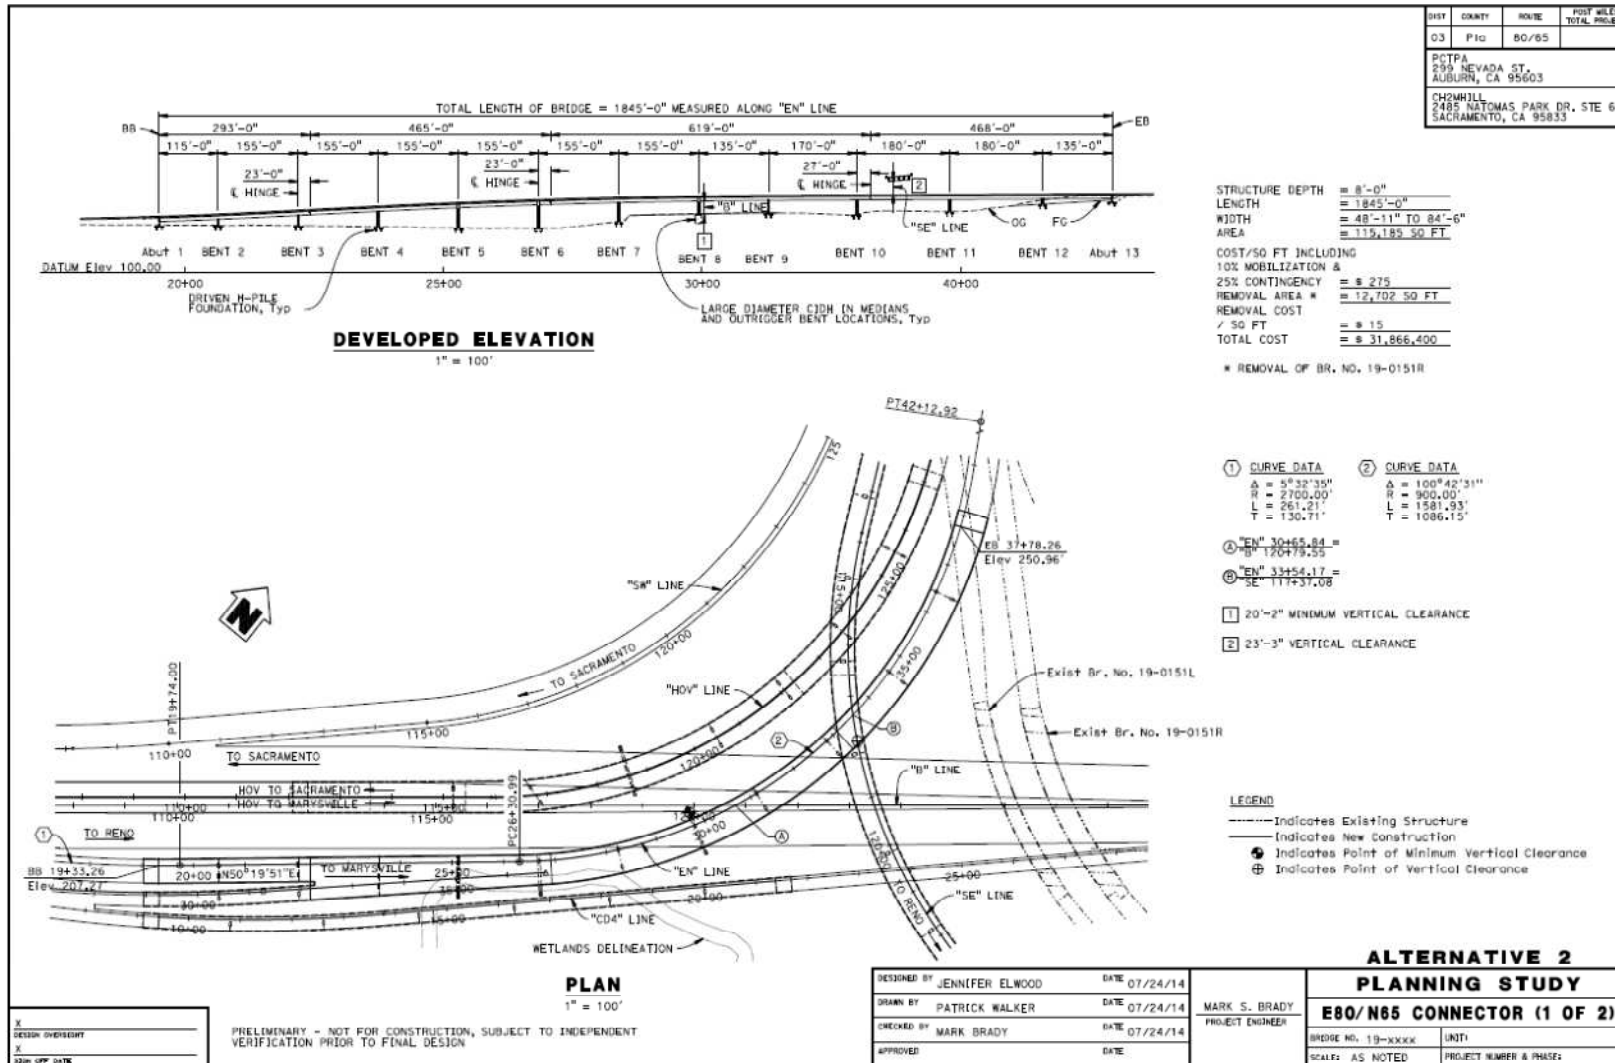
Proposed EN Connector Plan (Alternative 2) (1 of 2)
